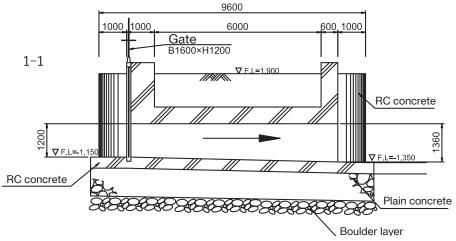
Example Plane Drawing of the Drain Gate ³⁾
